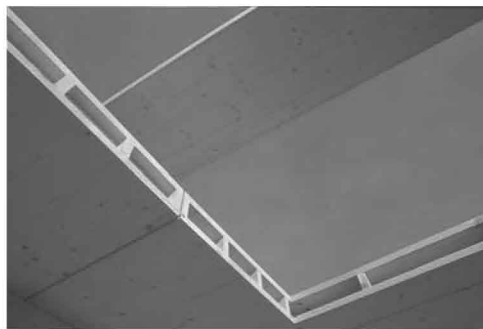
Opening in timber box element floor, with voids not yet closed off
